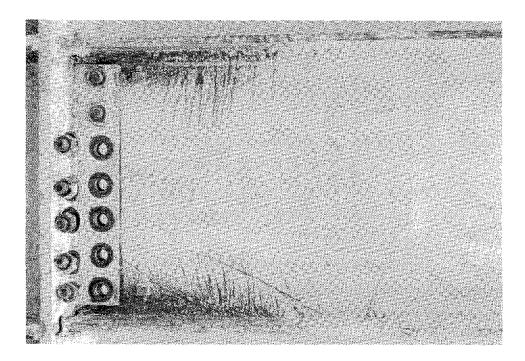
Specimen with Bolted Web and Welded Flanges After a Test Program Shown in Fig. 9 (b).
